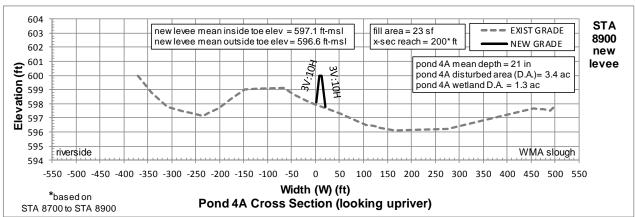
Cross Sections for Proposed Pond 4A (cont'd)
